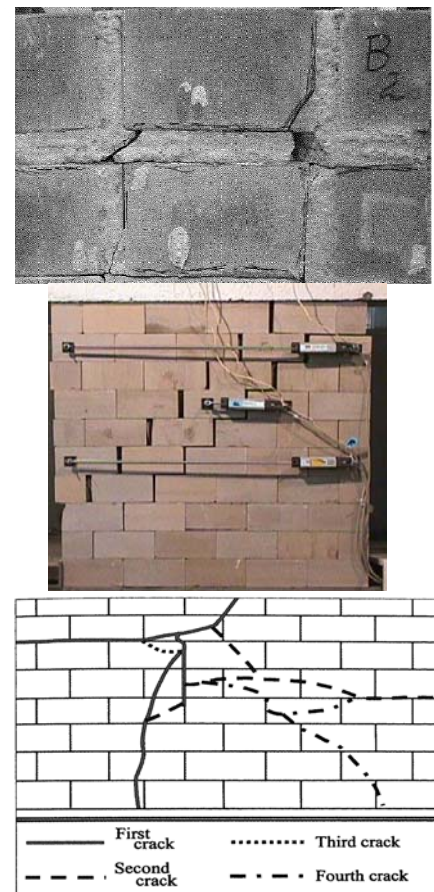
Modes of Failure under Shear: Traditional (10mm joint) Lourenco et al (2004); Dry Stack (0mm joint) Marzhan (1997) and Thin Bed (~2mm joint) Masonry Specimens (Fried et al(2005).
